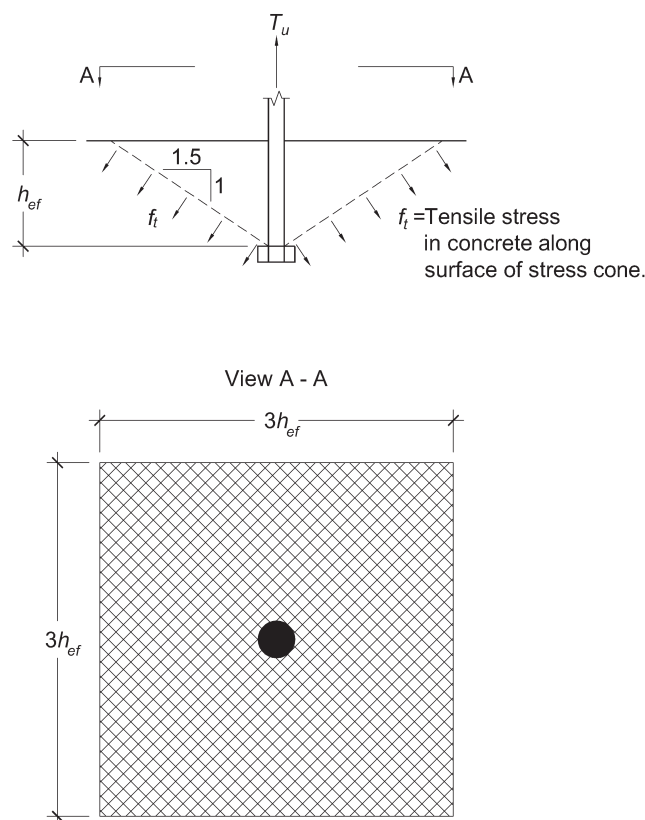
Full breakout cone in tension per ACI 318-08.
